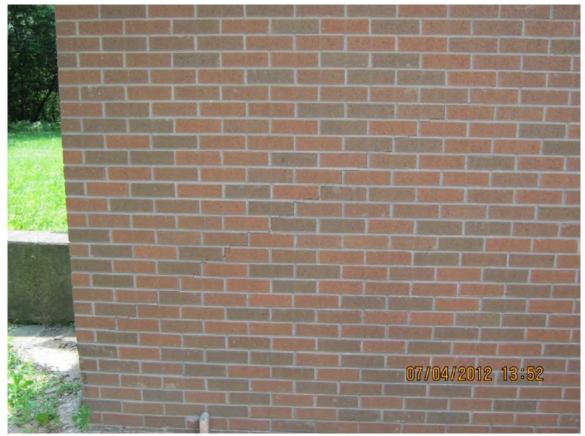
Exterior of east wall at south end – mortar crack in brick work
